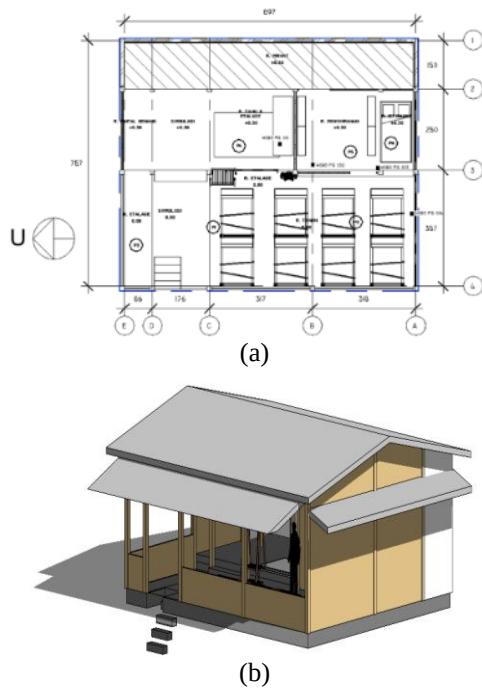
Jajaq Bayan (a) Floor Plan, (b) 3D Building Visualization
